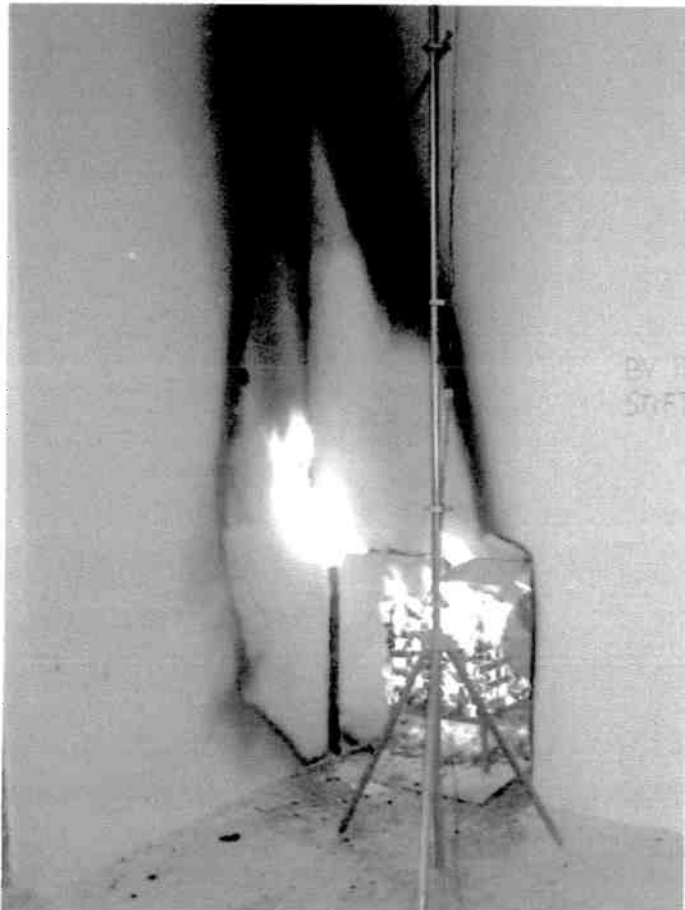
(P1060113): Test specimen during testing (16 minutes into test)
